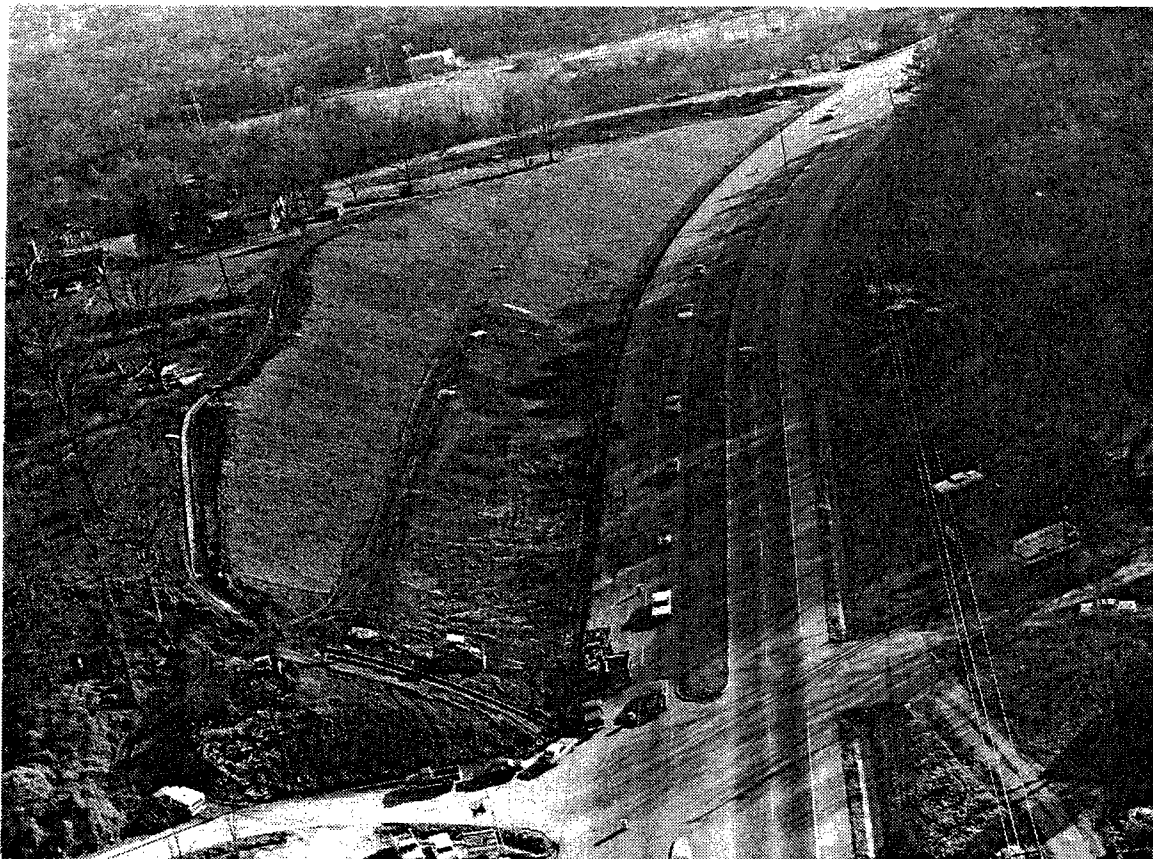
Slope flattening, benching, surface drainage, and sodding were used in the correction of a failure along State Route 33 in Knox County.
